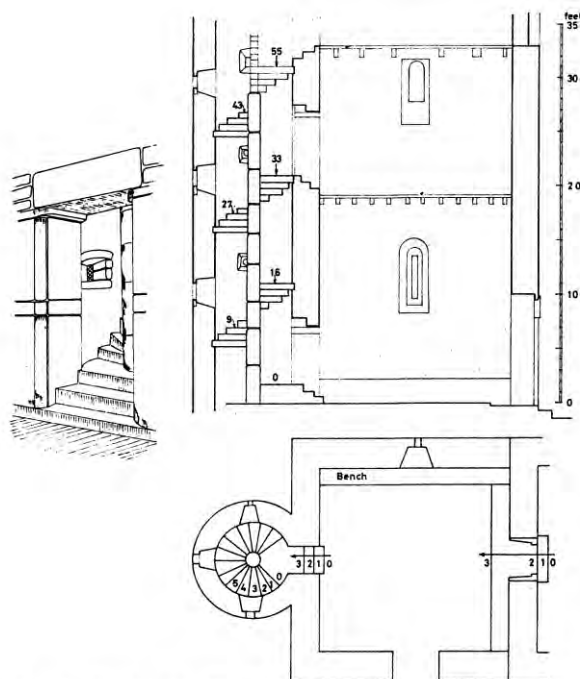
Hough-on-the-Hill: All Saints' church. Plan and elevation of the Anglo-Saxon tower, with a perspective drawing of the doorway to the first-floor chamber
